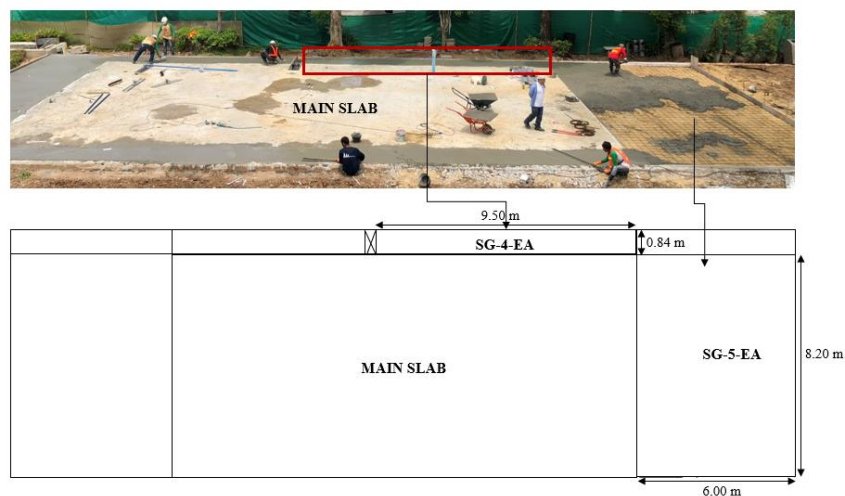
Plan view and site condition of the investigated slabs on grade 2 at construction site 2
